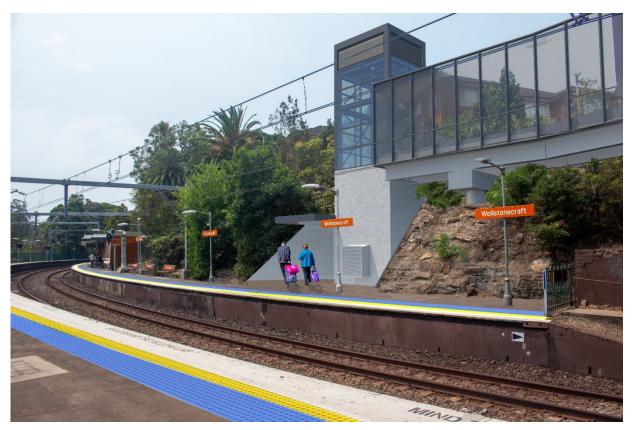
Photomontage view from Platform 2 looking toward Platform 1
